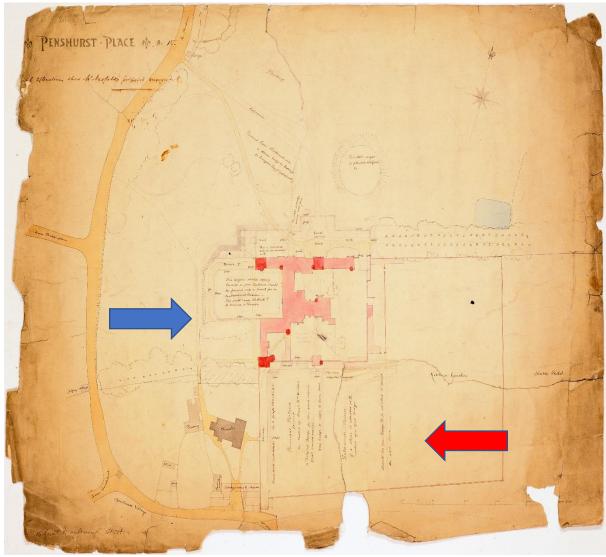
Devey's garden plan for Penshurst Place circa 1850s. RIBAPIX 13355.
